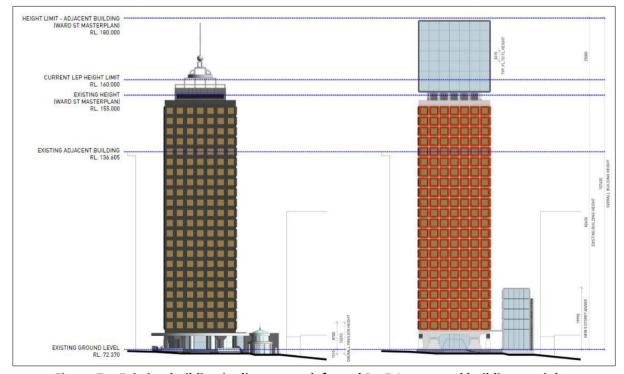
Existing building in diagram on left, and PreDA proposed building on right.
